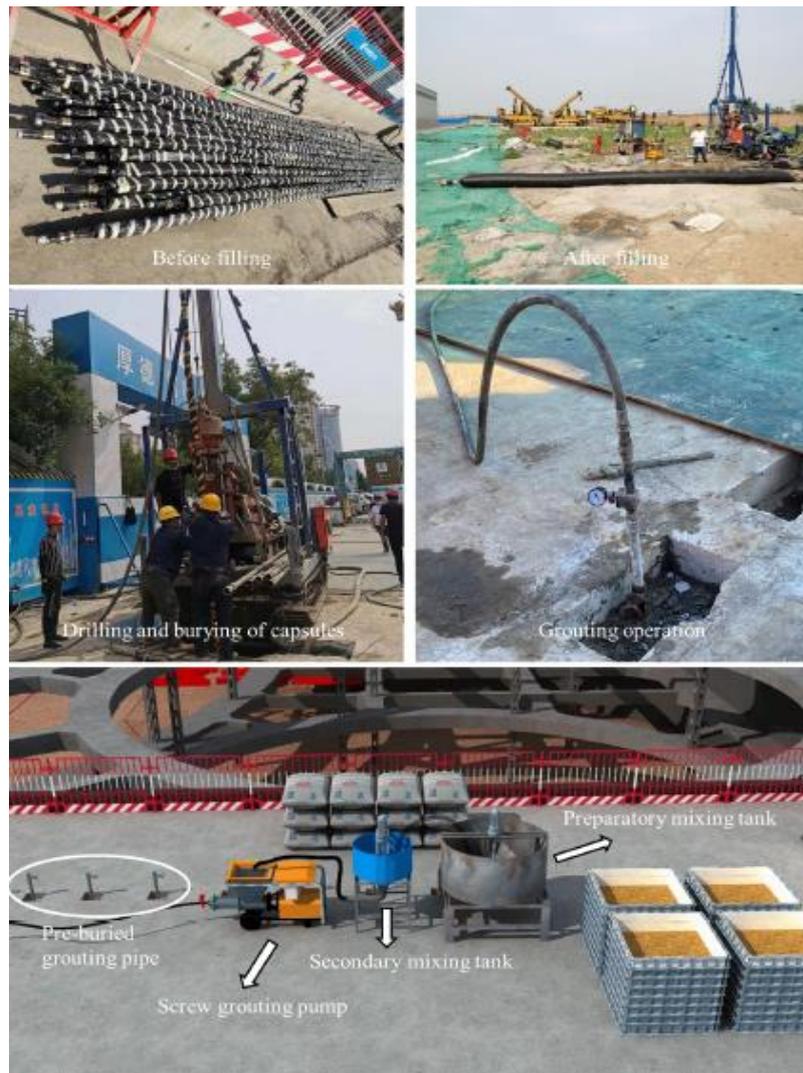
Capsule Grouting Equipment and Procedure (Zheng et al., 2022)
